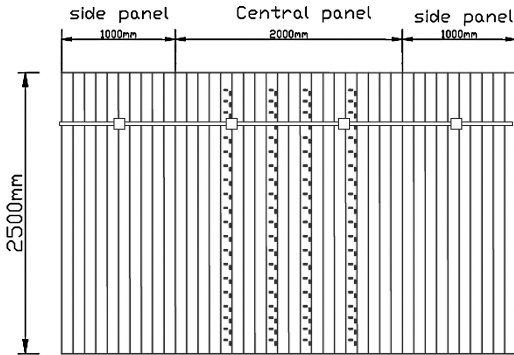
Independent sections of the articulated wall arrangement with location of strut load application and strain gauges along four individual wall members.
